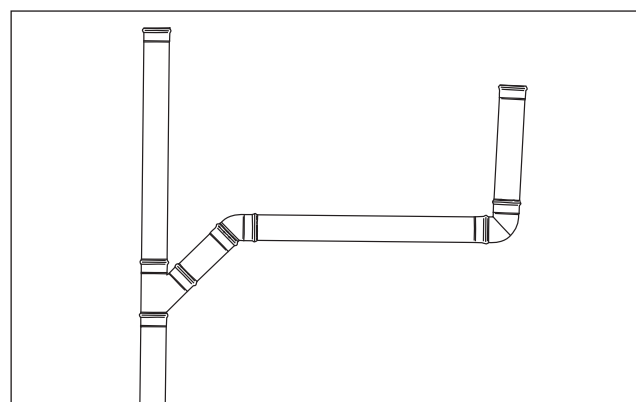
Branch pipes with a minimum connection angle of 45° can be used when connecting ventilated side pipes.
